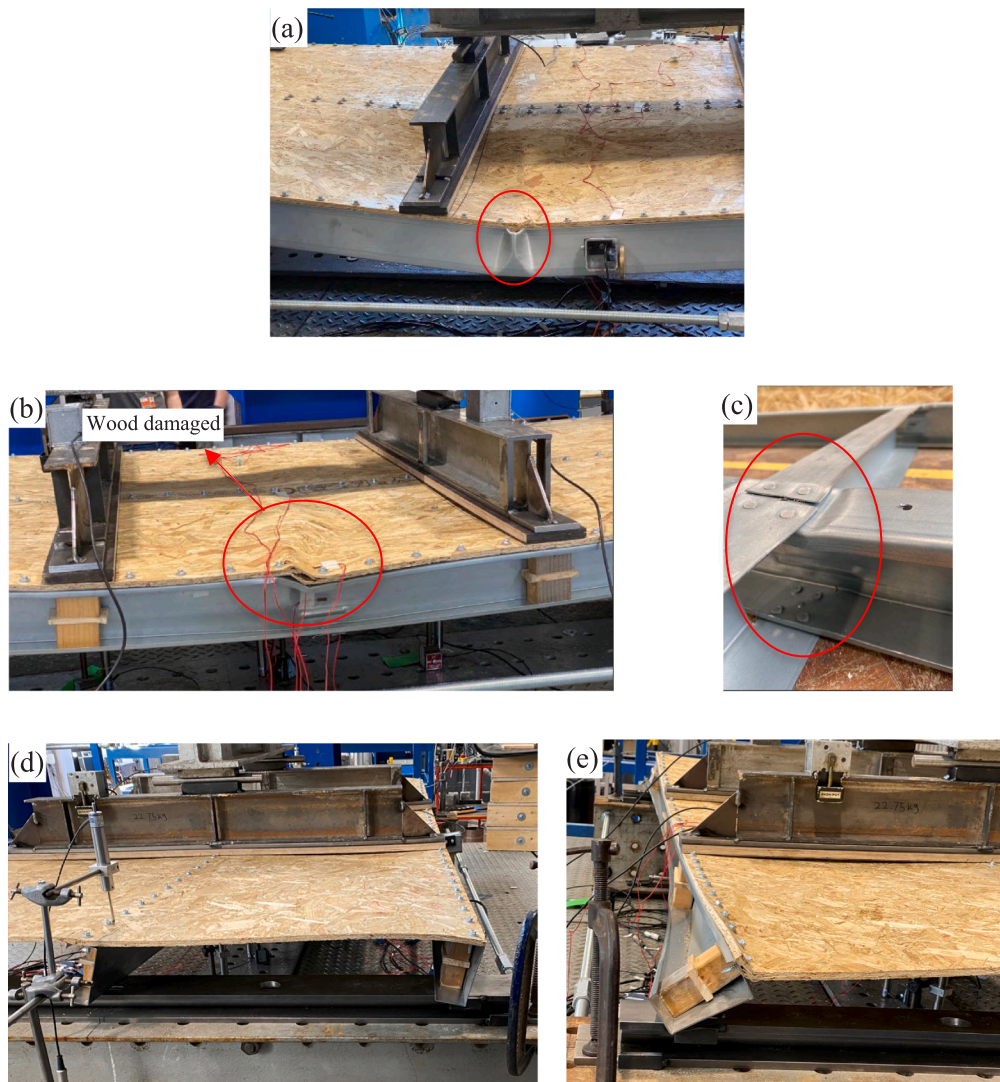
Failure modes of (a) S specimen, (b) N specimen, and (d, e) NT specimen.
